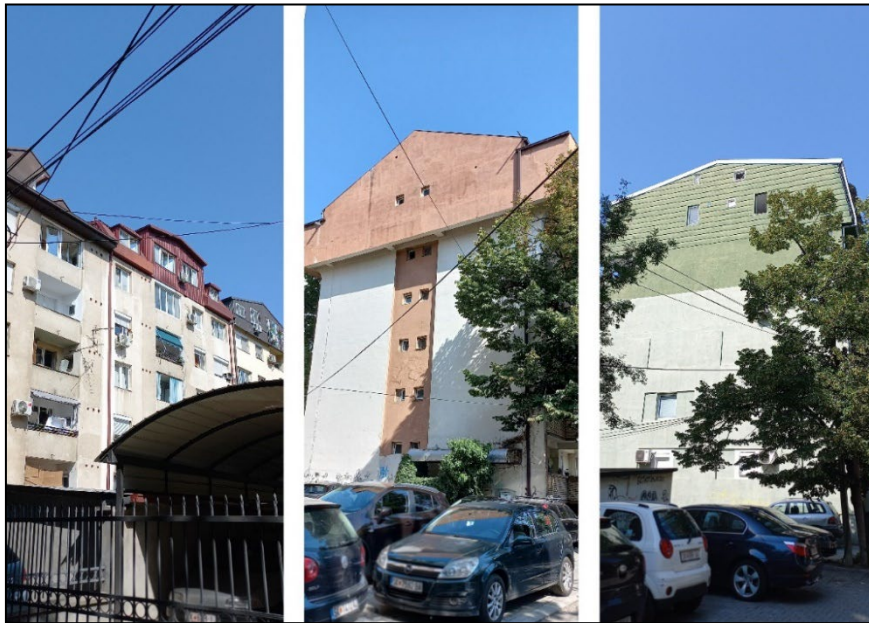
Buildings with mixed structure without use of expansion joints. Sources: photos by K. Edip.
